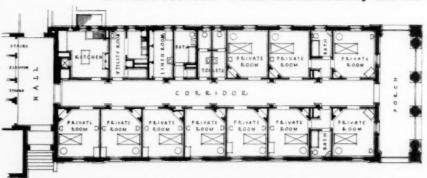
Samaritan Hospital-Private ward building. First floor plan. Second floor similar.
